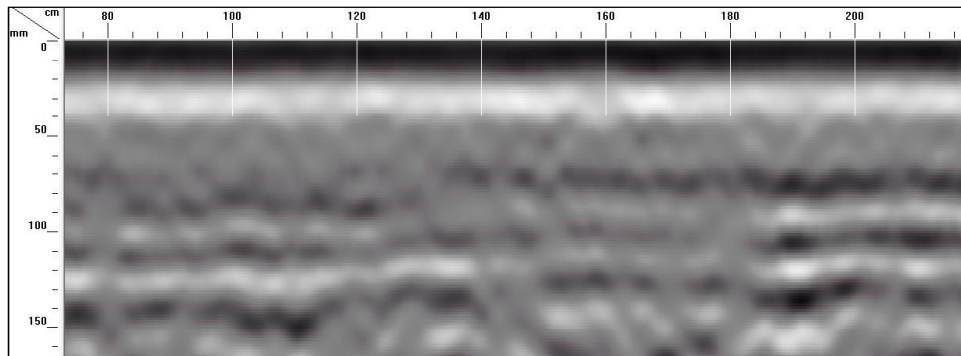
Sectional profile showing debonding in asphalt layers at 100 mm
